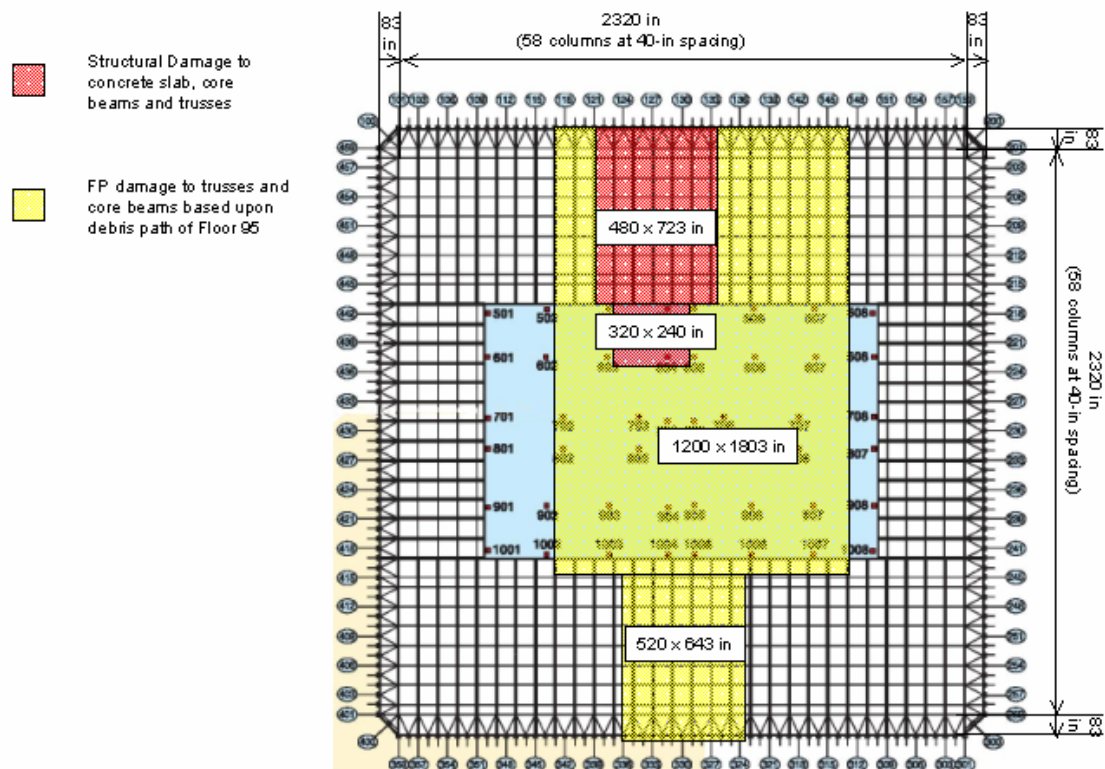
Structural and insulation damage to Floor 96 of WTC 1, Case B.
